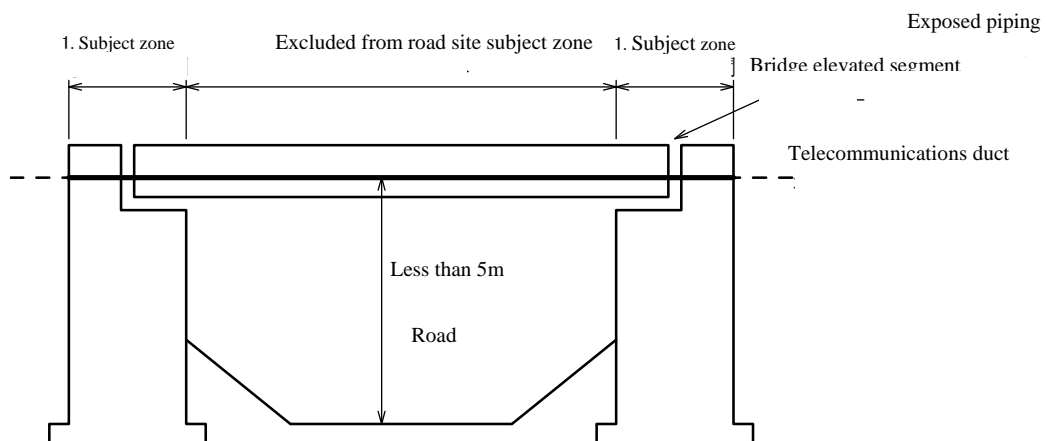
Less than 5m height to duct and where slope with grass space outside road site could be exposed to spreading fire
